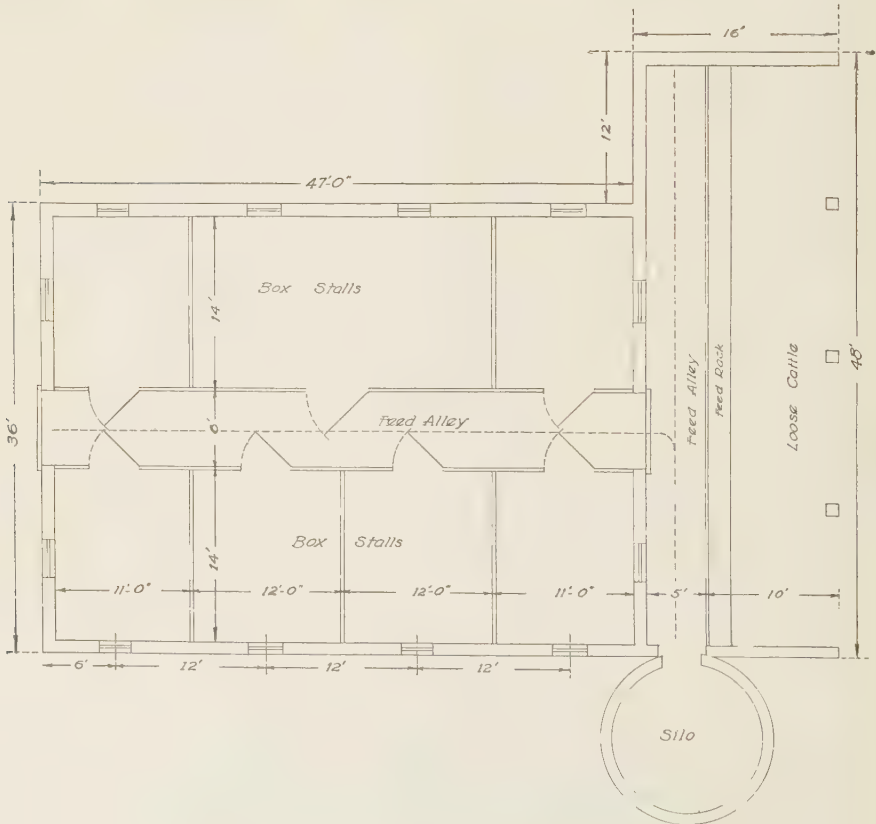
Floor plan of herd barn combining the enclosed pen and open shed features.
